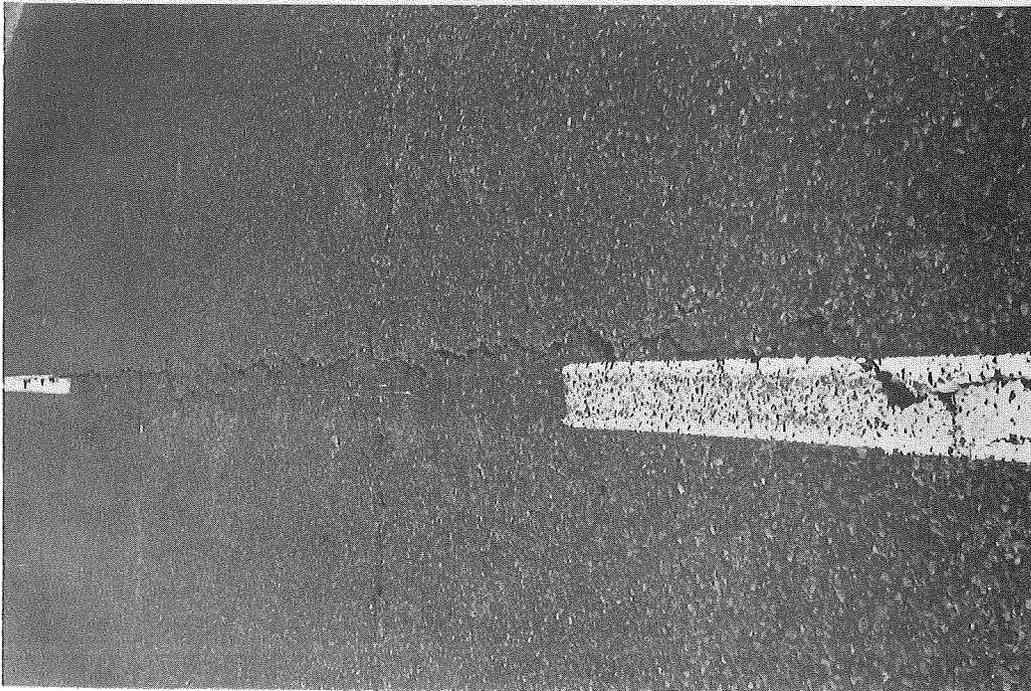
Typical longitudinal and transverse cracks reflected from underlying rigid pavement joints.
